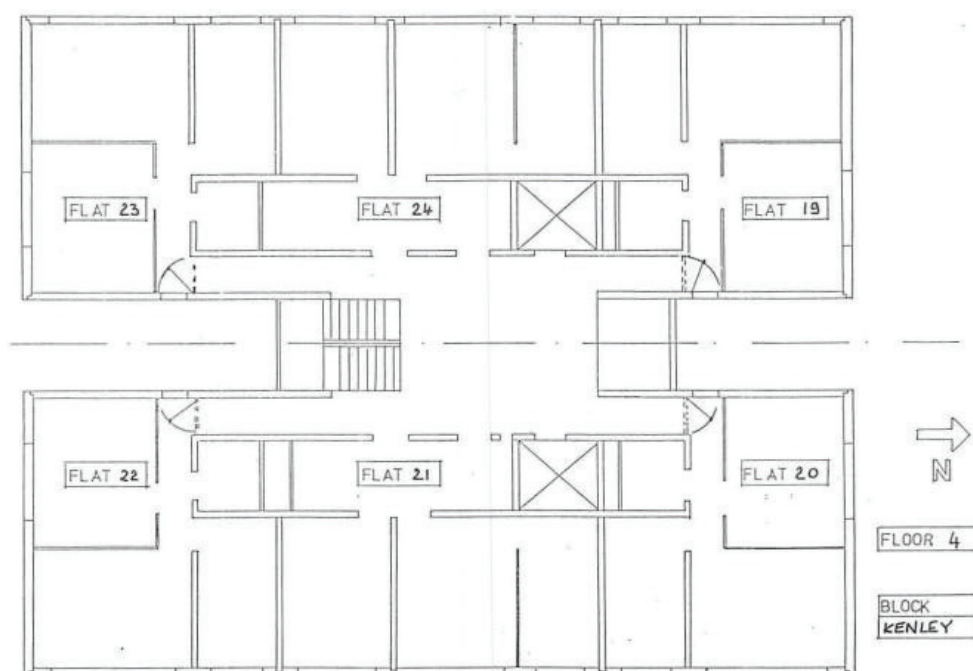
Example floor plan in 18-storey dwelling block (4th Floor Kenley) (Building Design Partnership, 1985)
